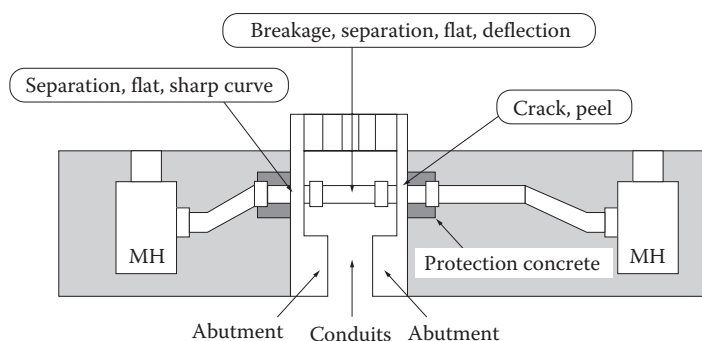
Damage of conduits attached to the bridge (Kobe earthquake).
